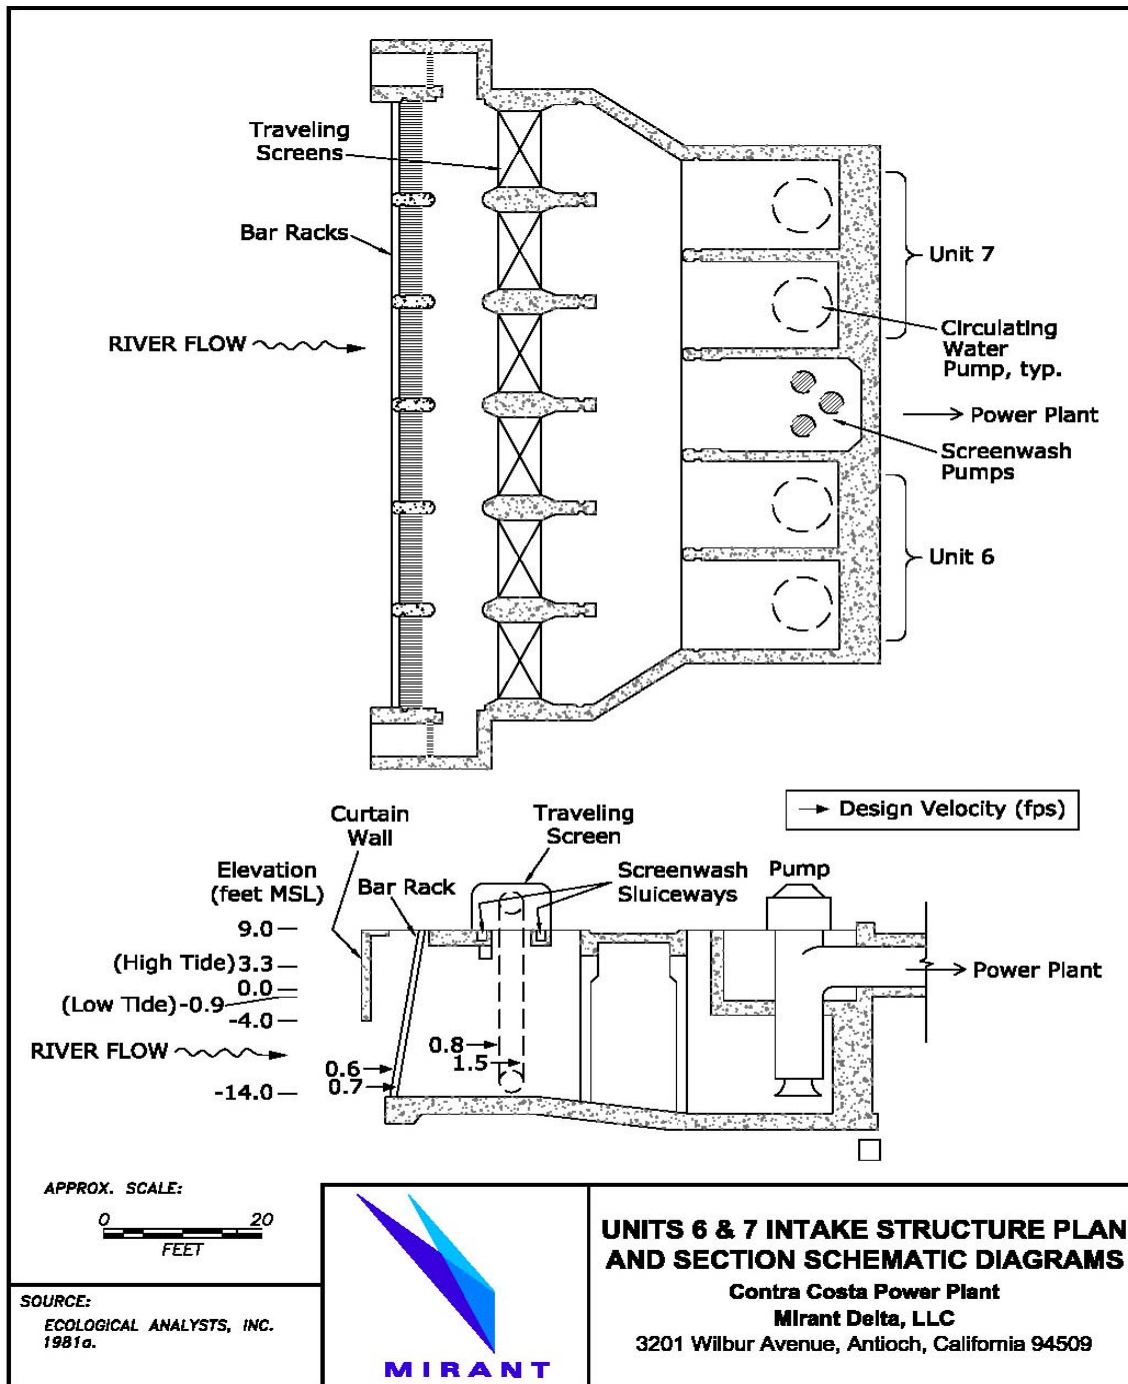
Plan and section schematic diagrams of the Contra Costa Power Plant Units 6&7 intake structure.
